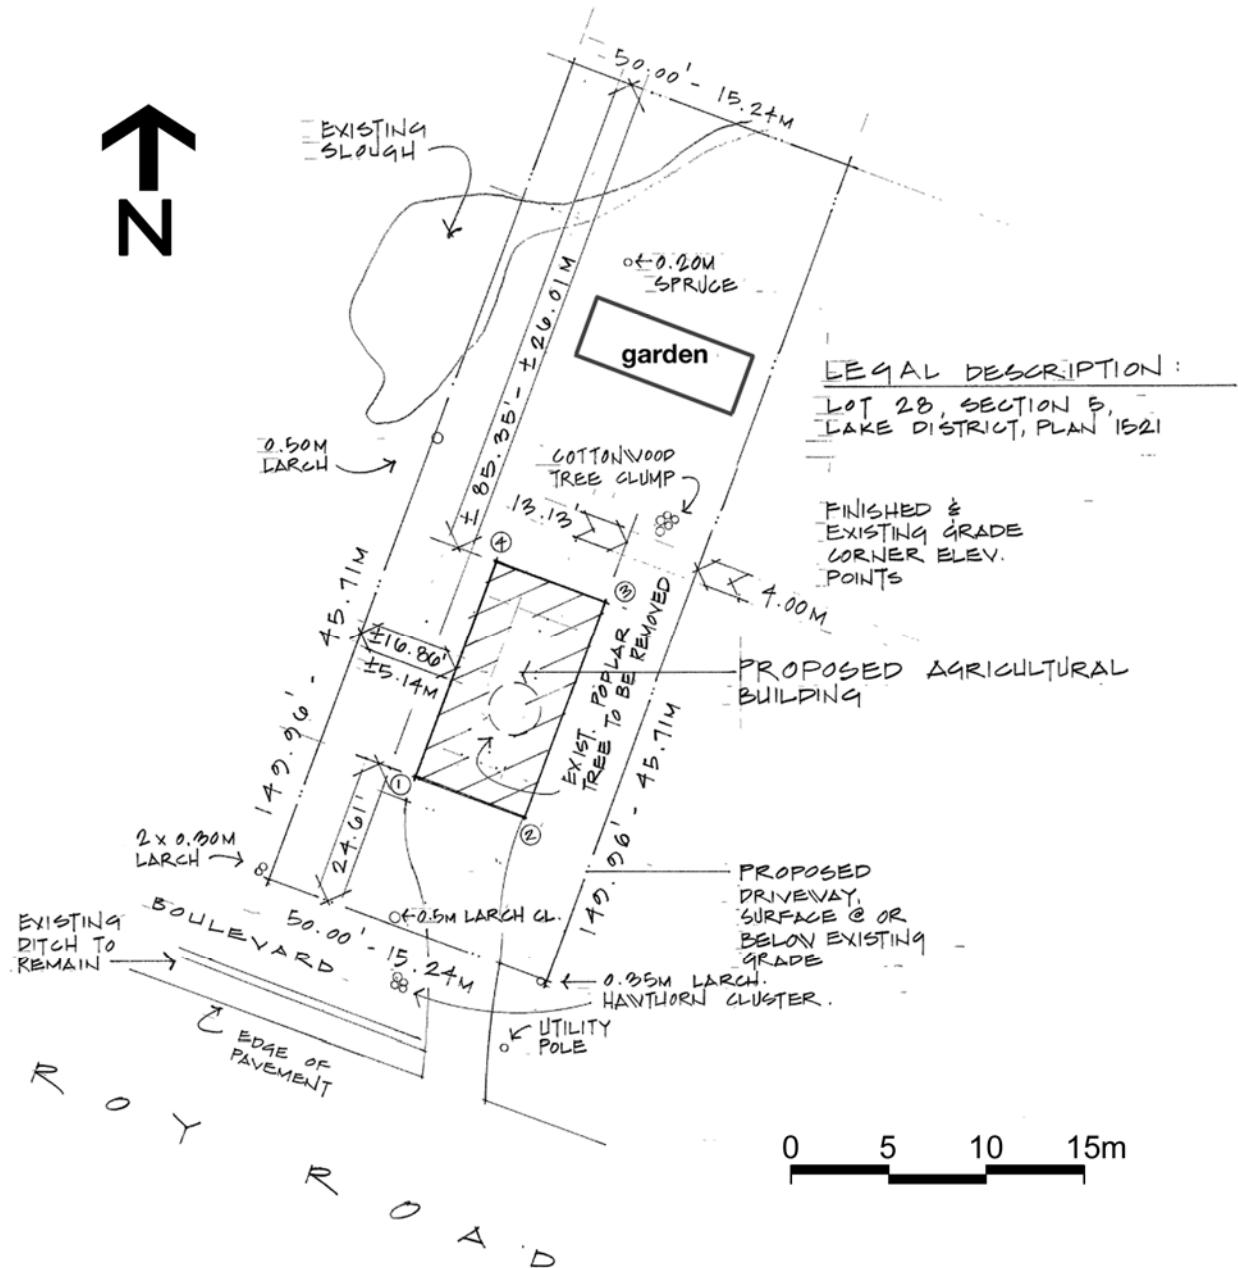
Proposed Site Plan (from plans by DeSign Zone)
